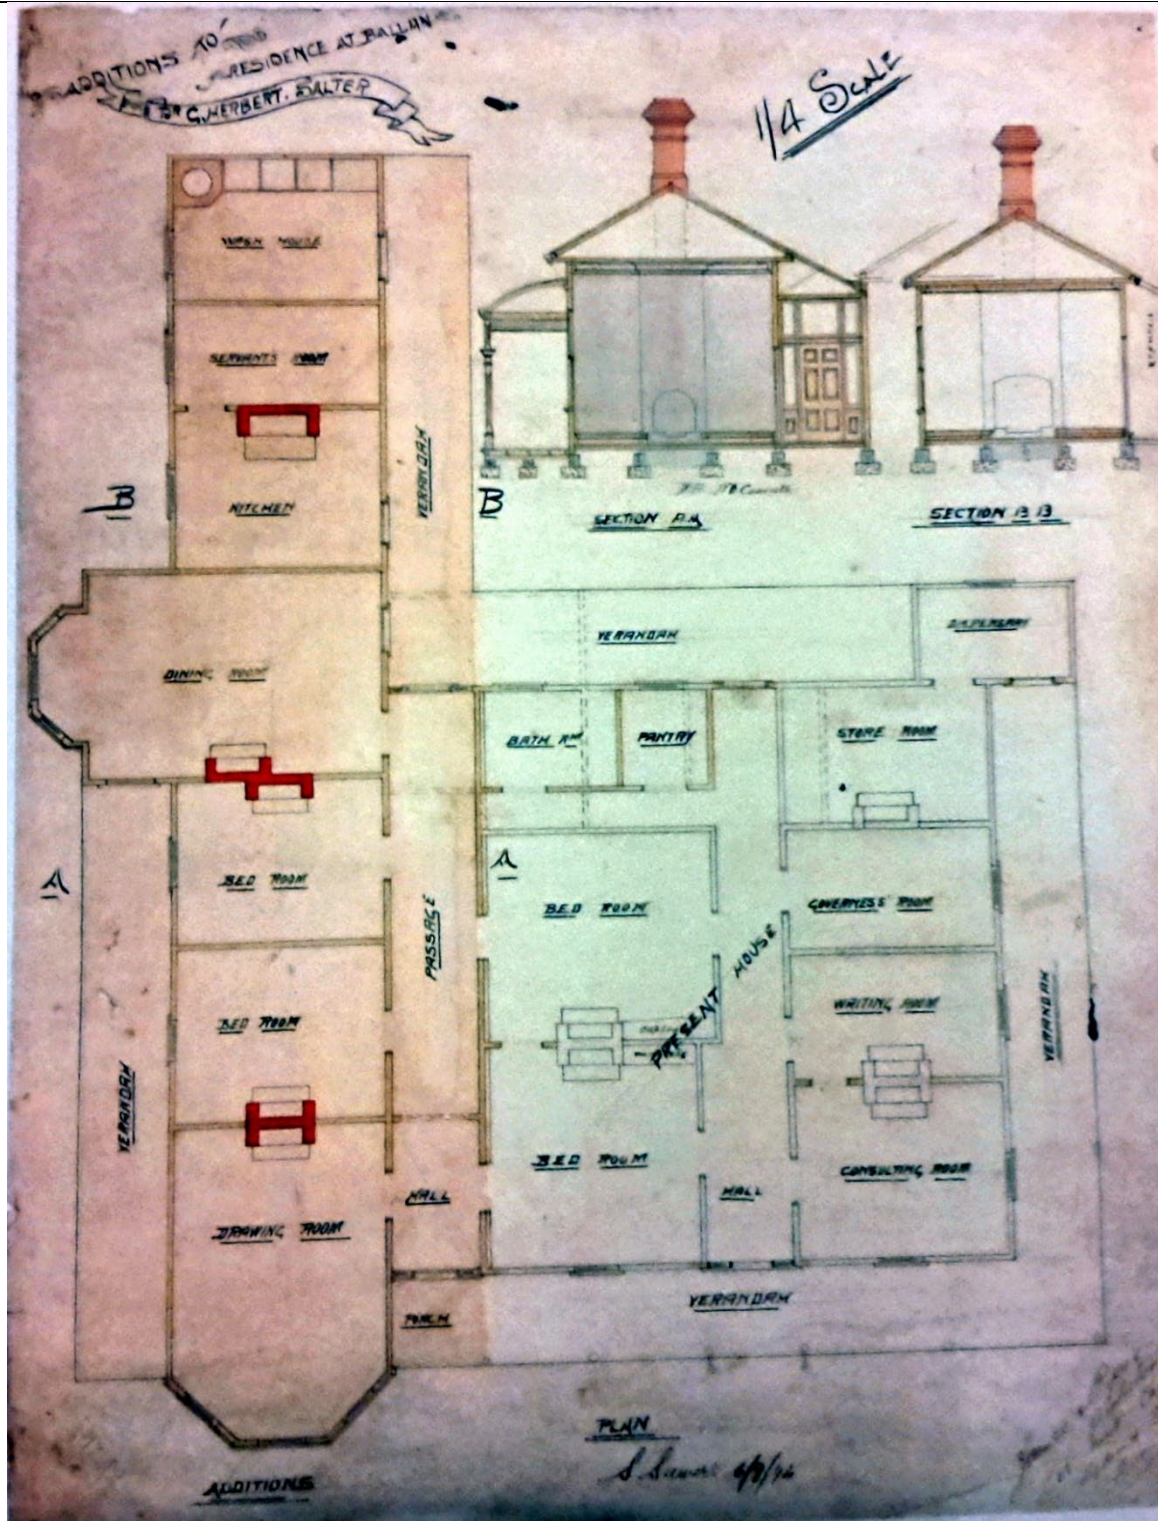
James and Piper architects, Ballarat: Floor Plan of proposed additions to Dr Salter's residence, Ballan, 1894.
